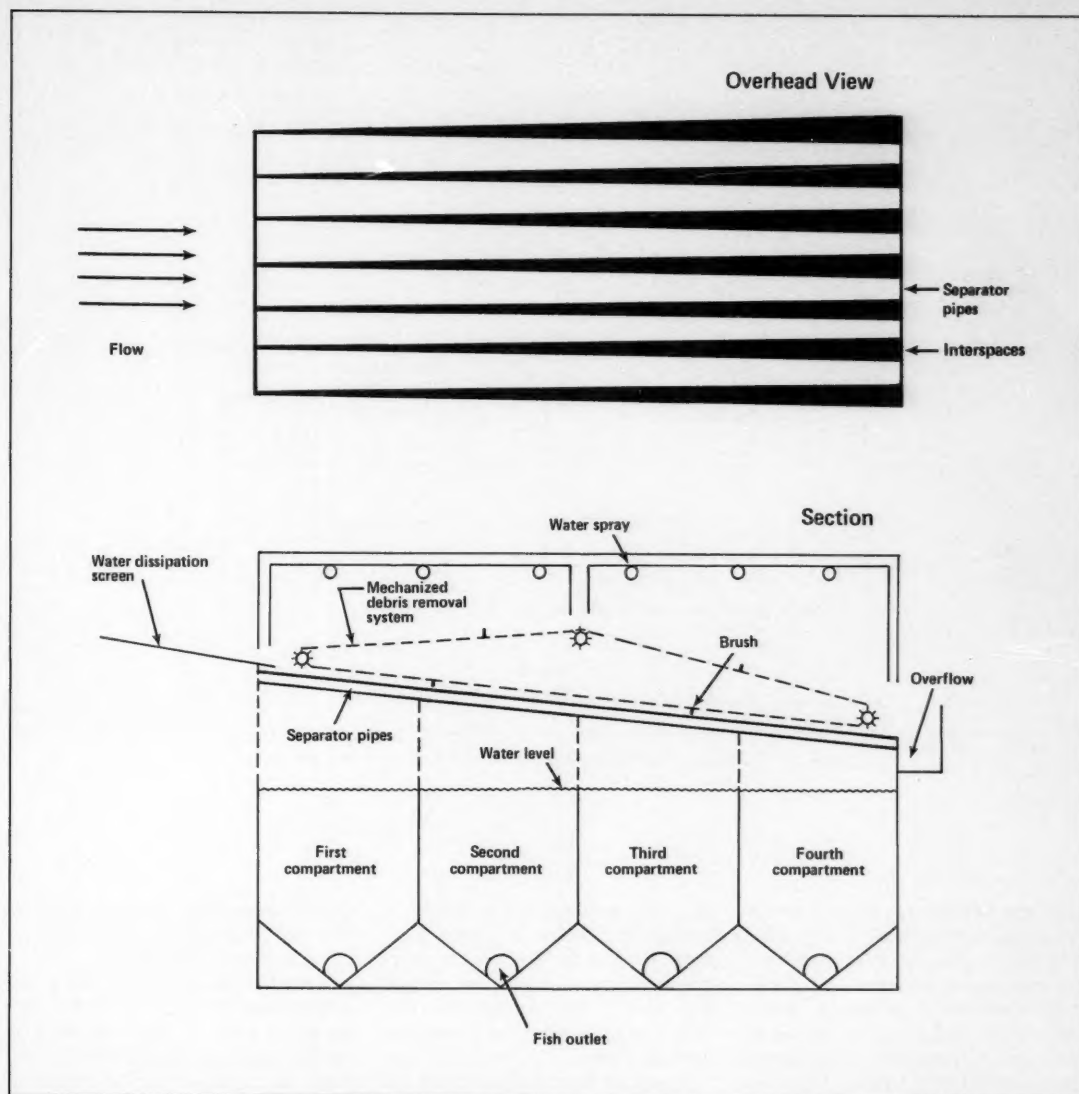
Side view of dry-type separators at collection facilities prior to 1982.
